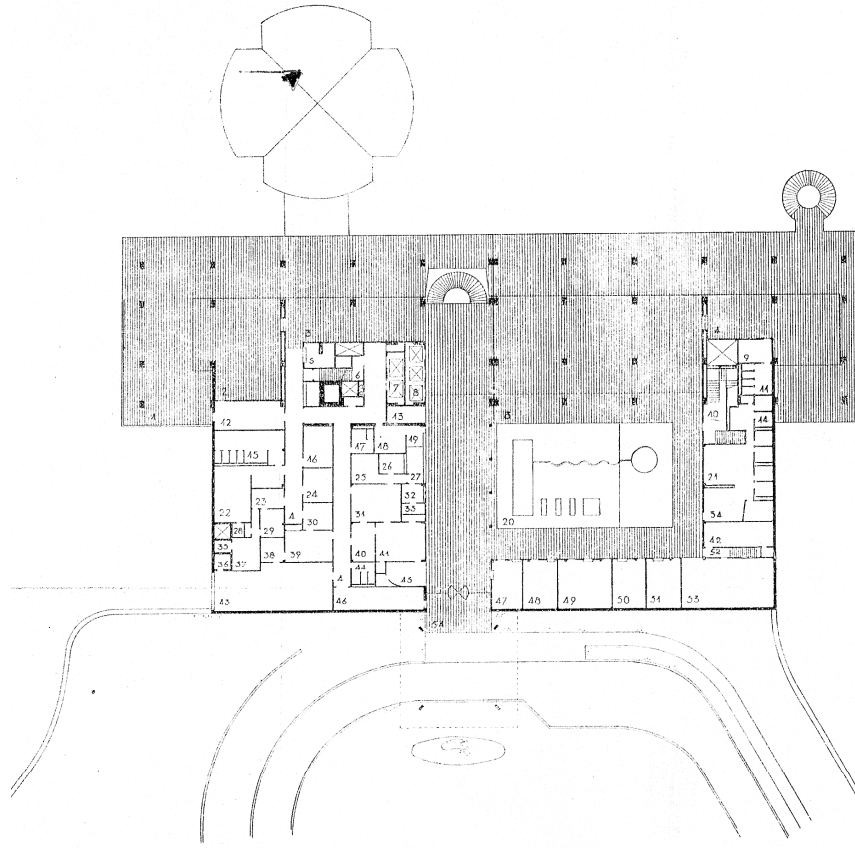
Hilton Hotel Typical Room Shaft Flor Plan
